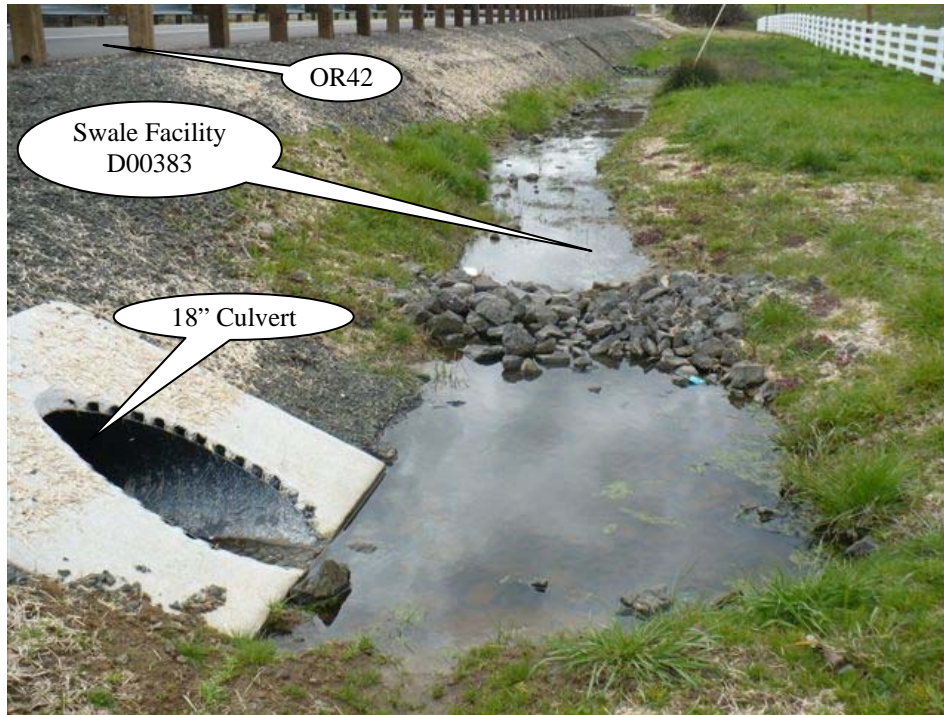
Looking west, flow from the swale and swale underdrain discharge directly into an 18-inch culvert.
